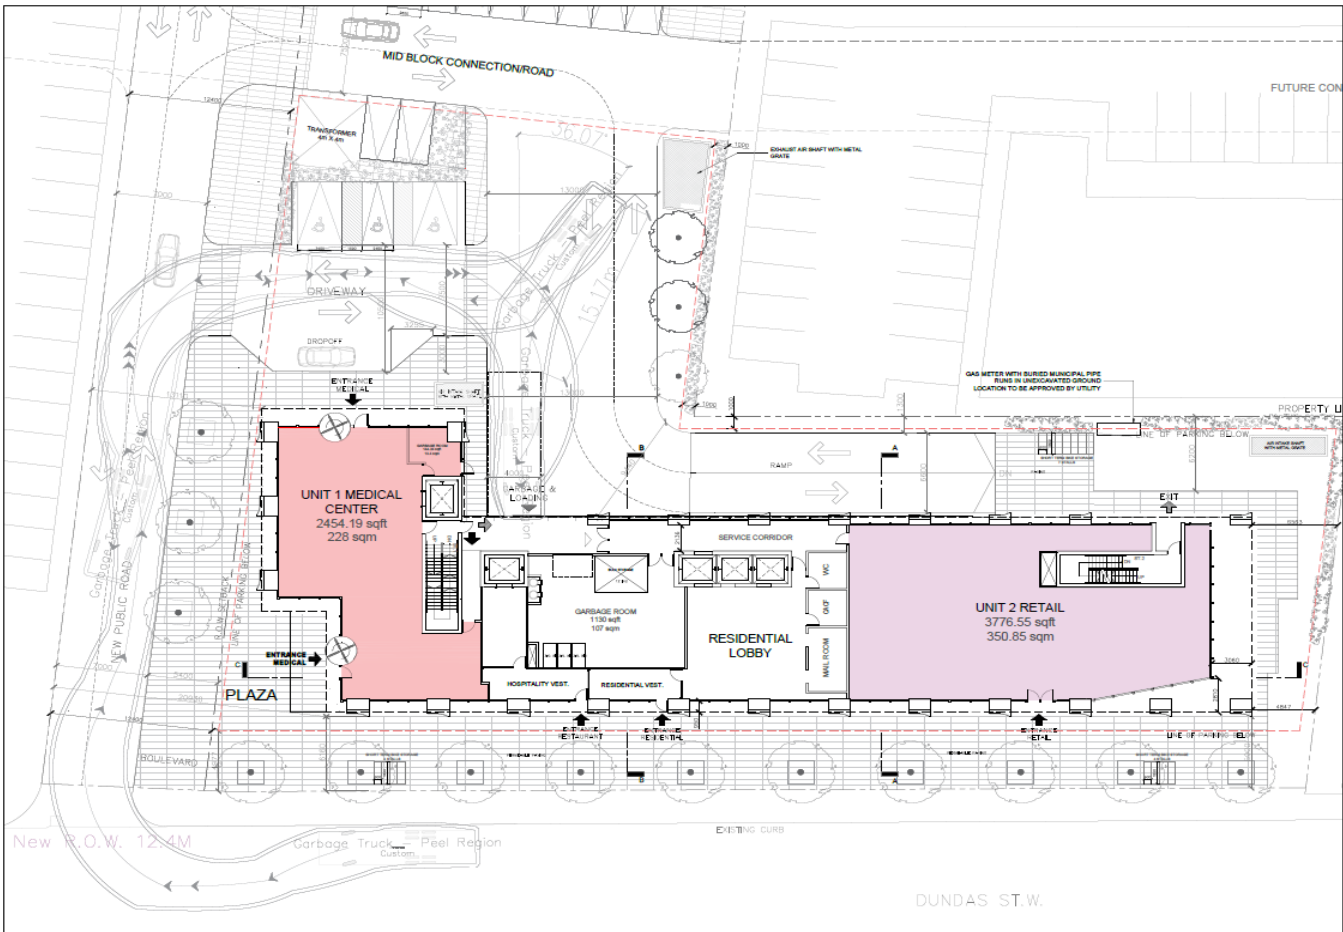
Ground Floor Plan, Prepared by Hout Architecture
